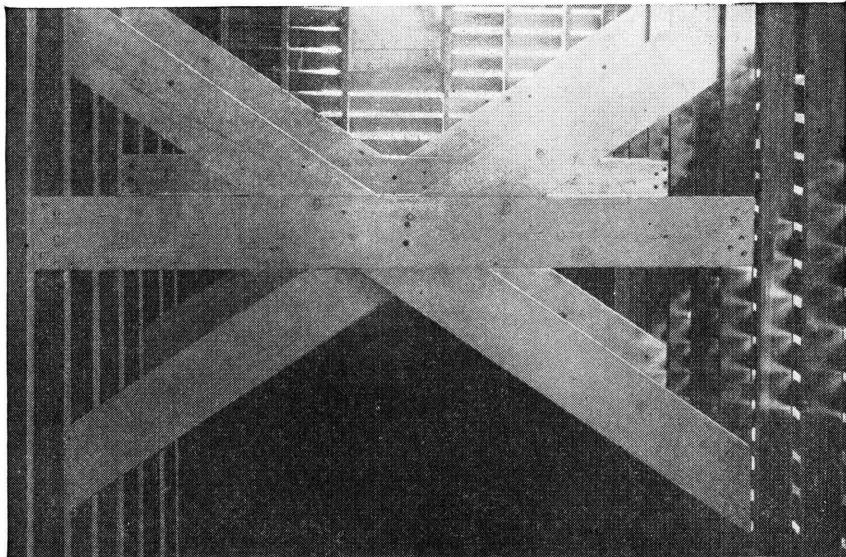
A good type of cross brace. Nail each joint with 15 eightpenny nails.
